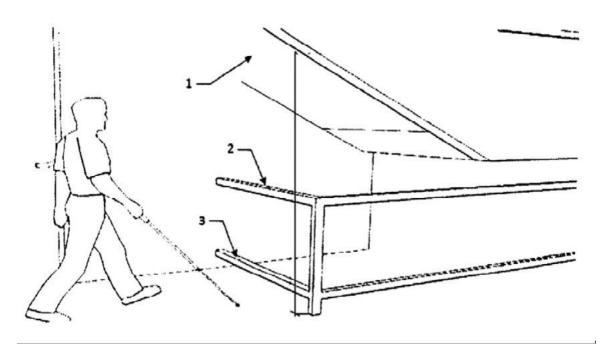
Overhead space under stairs in hallways $(1 - \min 220 \text{ cm net height} 2 - \text{guardrail} / 3 - \text{guardrail} \text{ that can be felt with white cane})$
